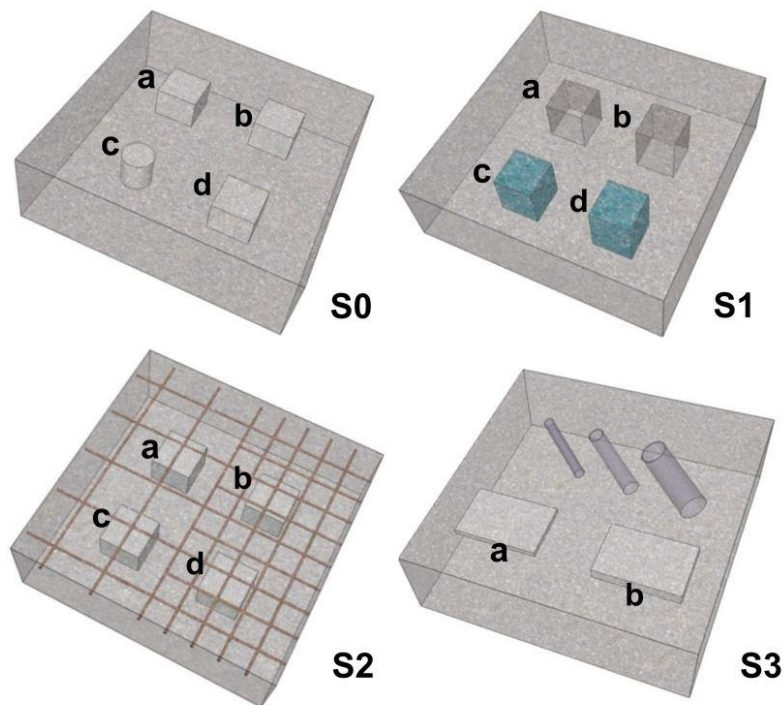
Sketches of laboratory concrete test specimens with inbuilt defects.
